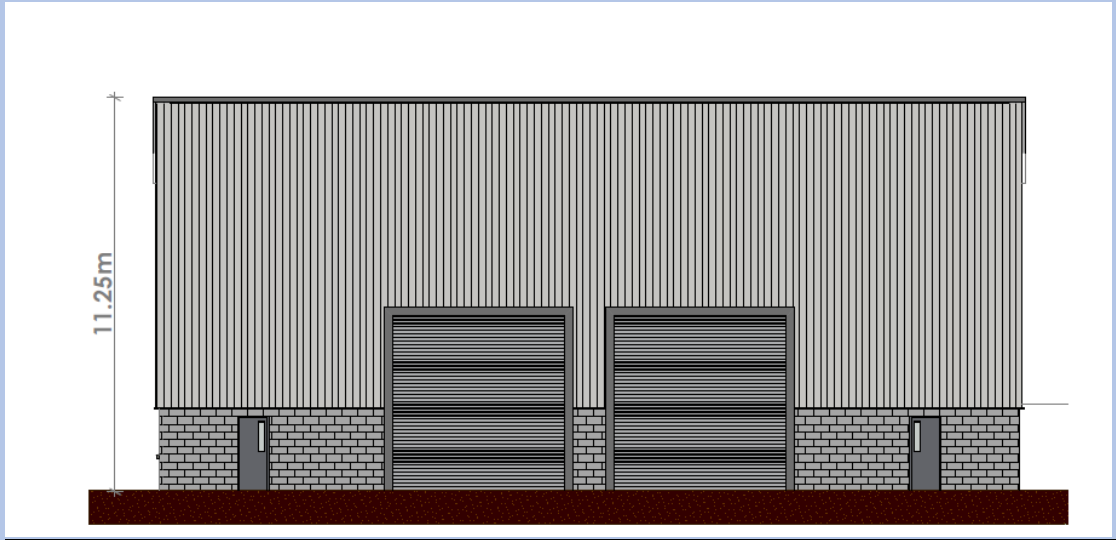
Zone 1. Goods in Building-Front elevation facing north (Image not to scale).
